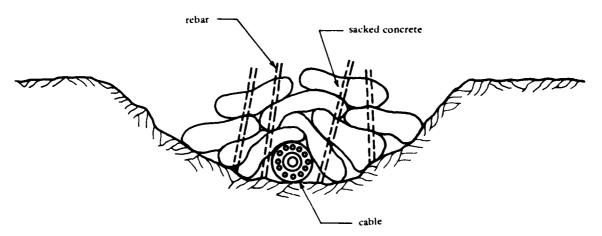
Configuration of typical sacked concrete stabilization system installation.
